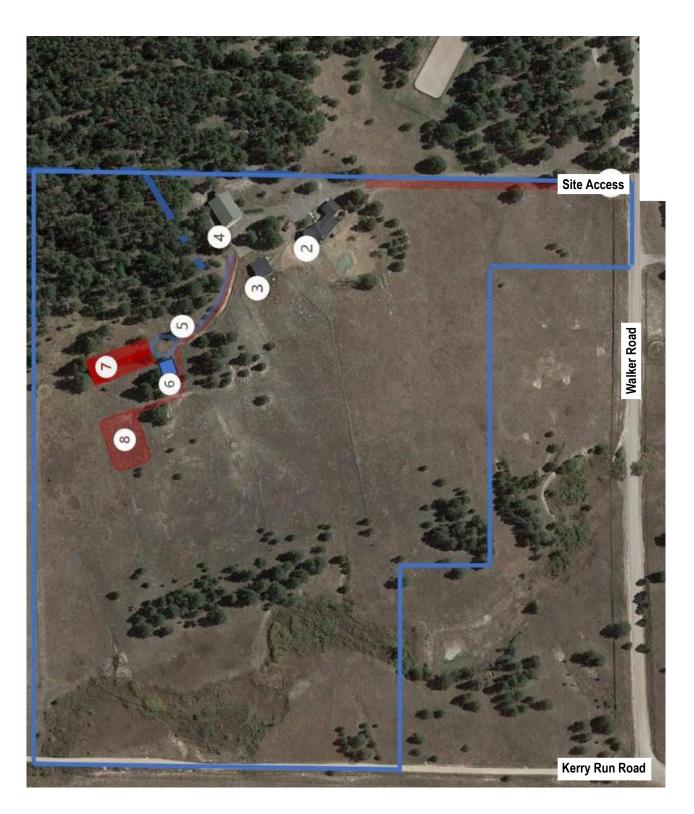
CONCEPTUAL SITE PLAN December 2023 Page 3
